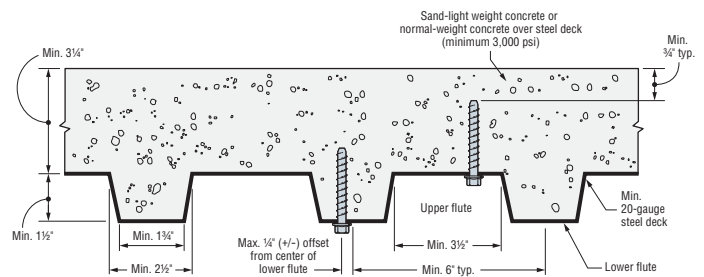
Installation of 1/4"-Diameter Anchors in the Soffit of Concrete over Metal Deck
